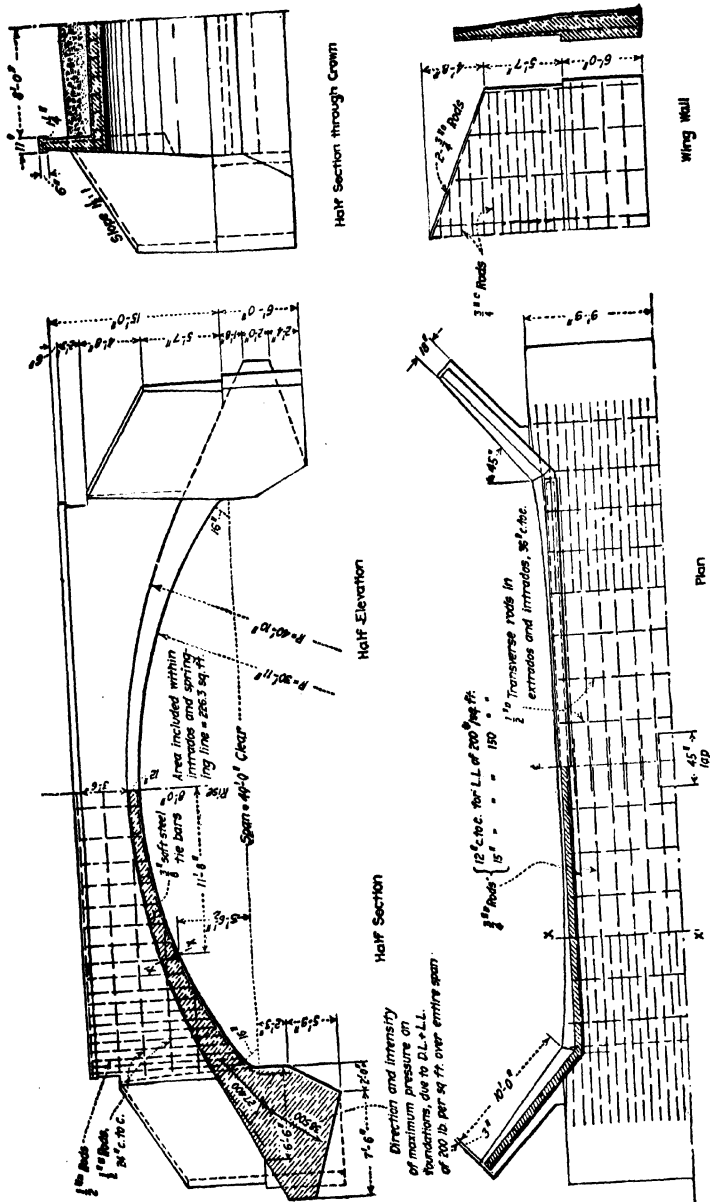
Standard 40-ft. arch, State of Missouri Highway Department.
